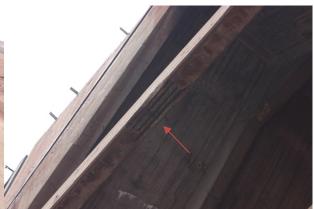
Shallow rebar visible on bottom of transverse beam on Bent 76.
